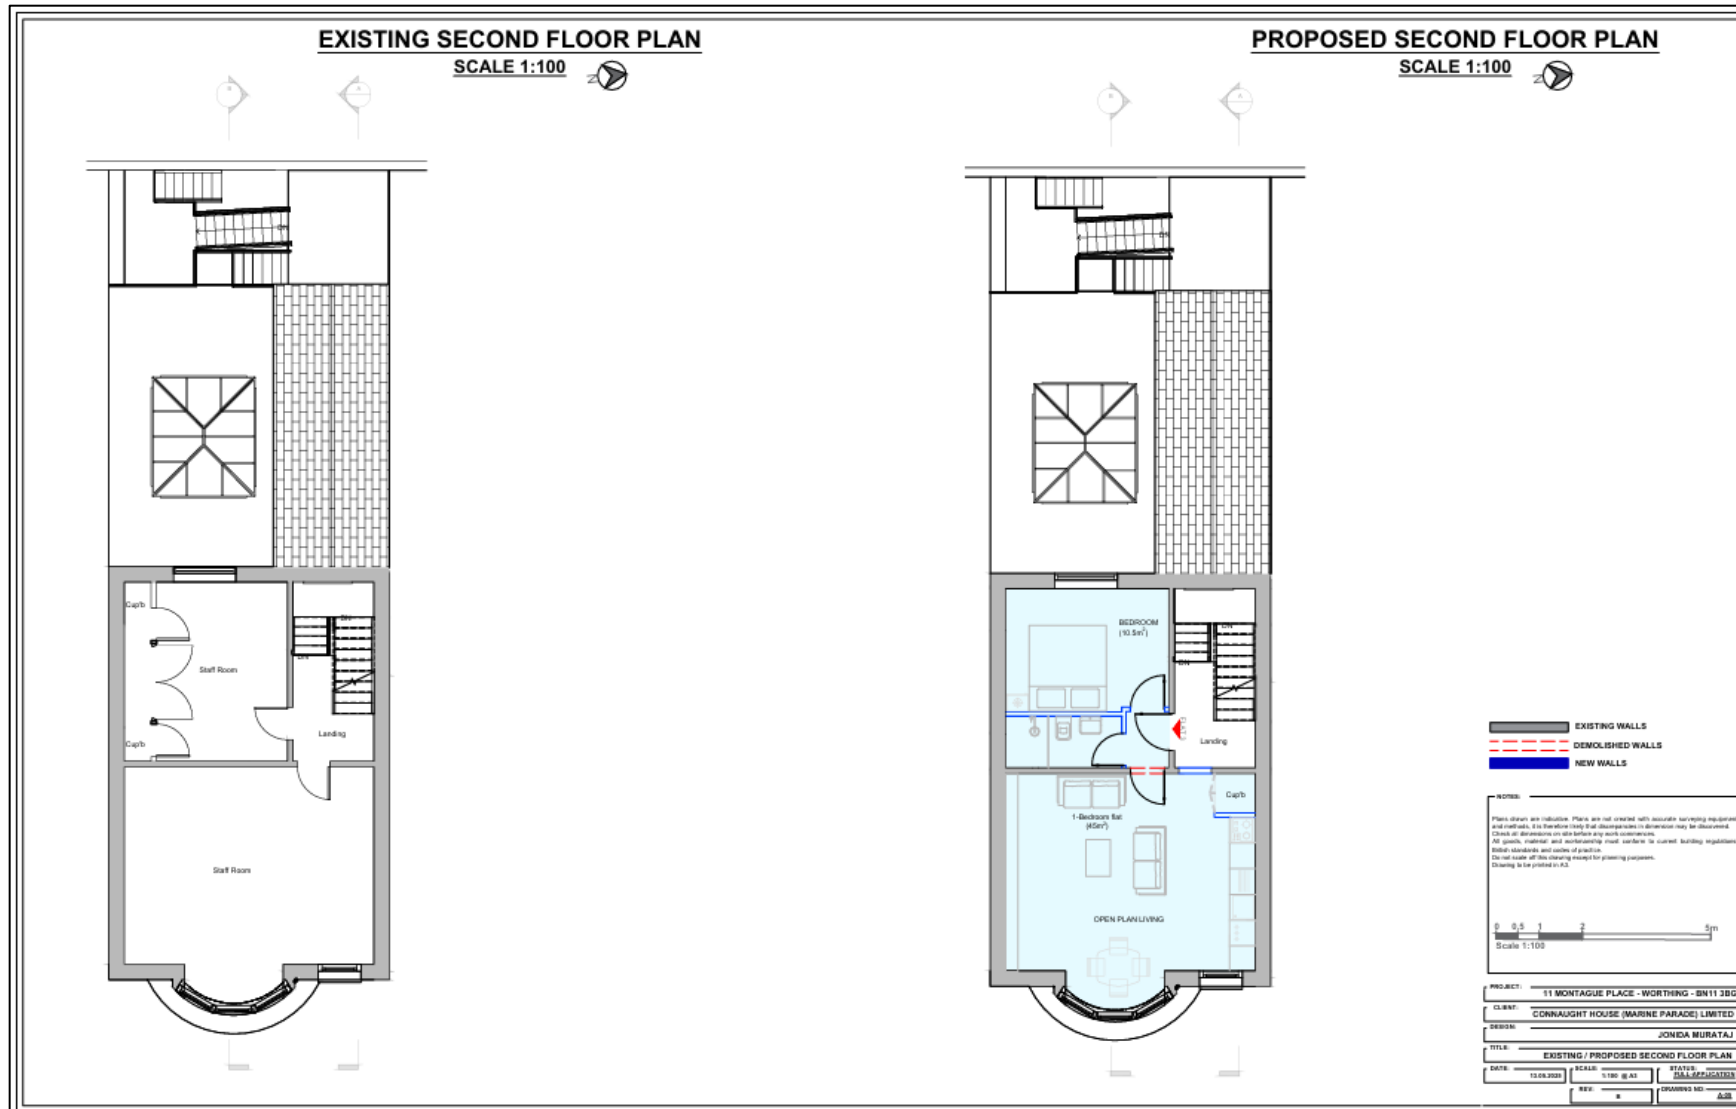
Existing and Proposed Site Floor Plans – Second Floor
